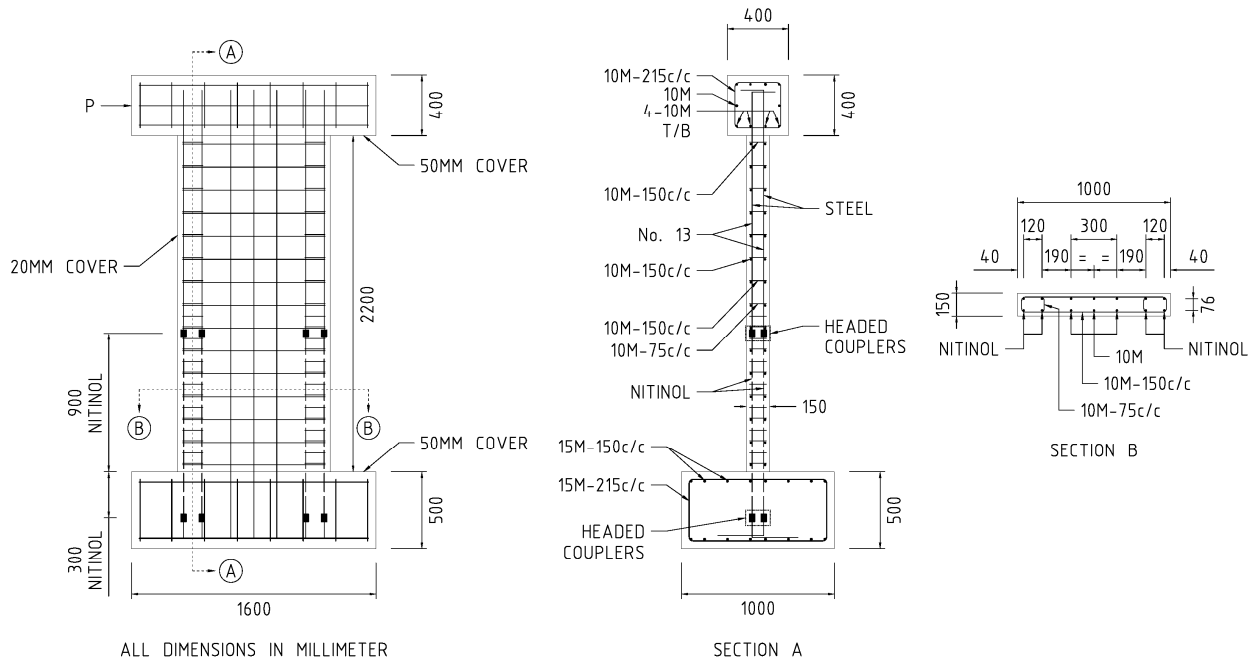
Reinforcement details of SE-SMA-reinforced wall.
